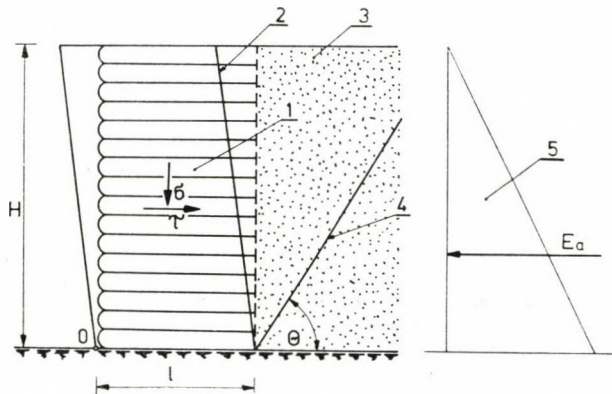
Failure mode of the reinforced earth wall by KÉZDI (1966) and SMITH — BRANSBY (1976); 1 — reinforcement, 2 — deformation line, 3 — backfill, 4 — failure surface, 5 — backfill pressure
